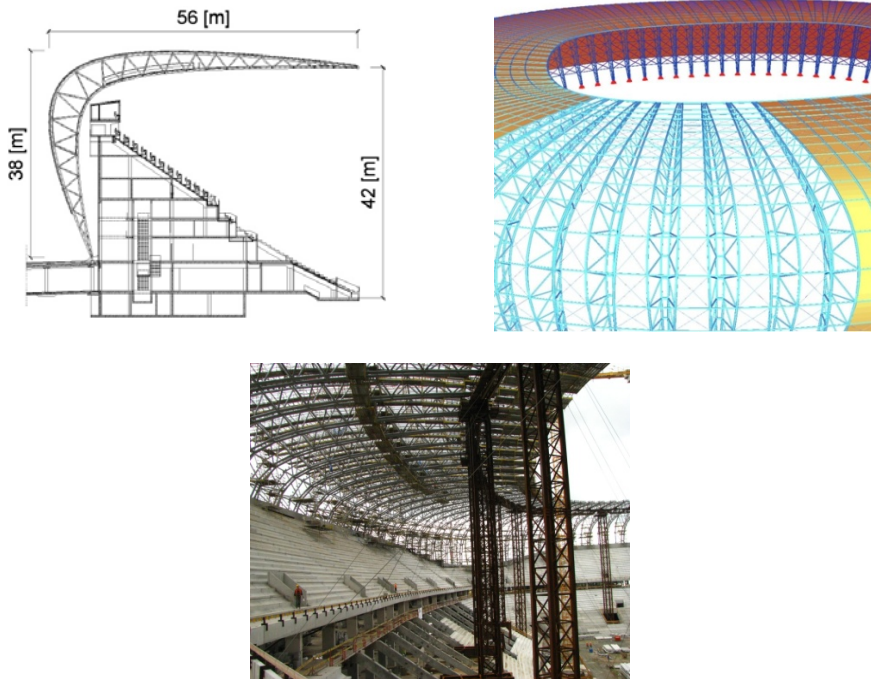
Roof structure. Static model (SOFiSTiK) and photo made 18.08.2010
